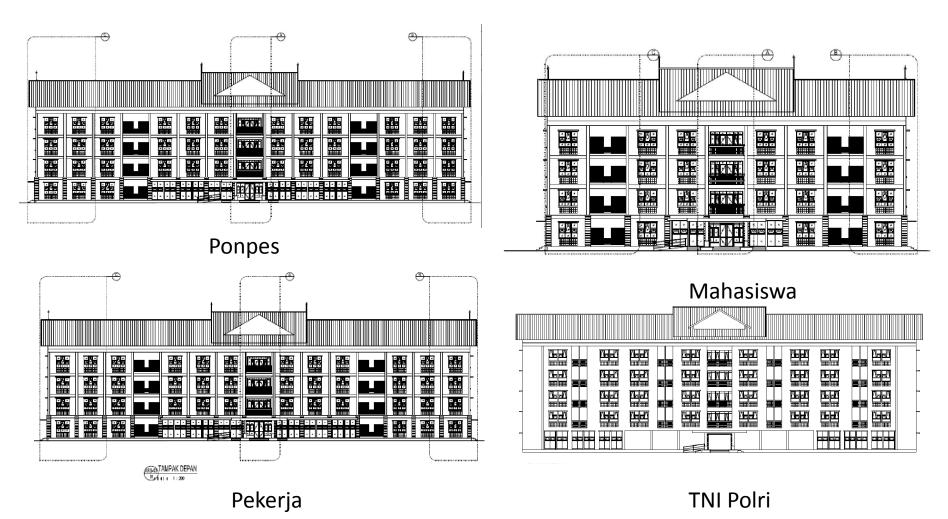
BIM Application in Precast Concrete Detailer in Low Cost Housing of Ministry of Public Works 1
